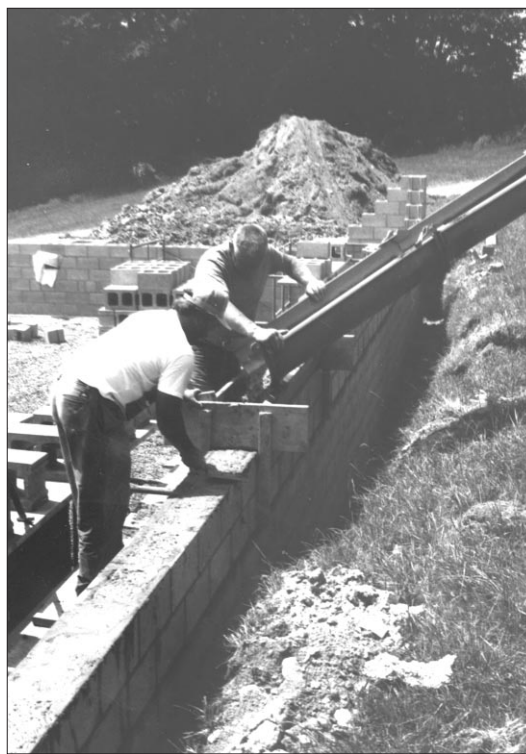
Filling the block cores with reinforcing steel and concrete can strengthen a block wall. Here, masons use a movable wooden form to direct concrete from the chute into the block cores.
